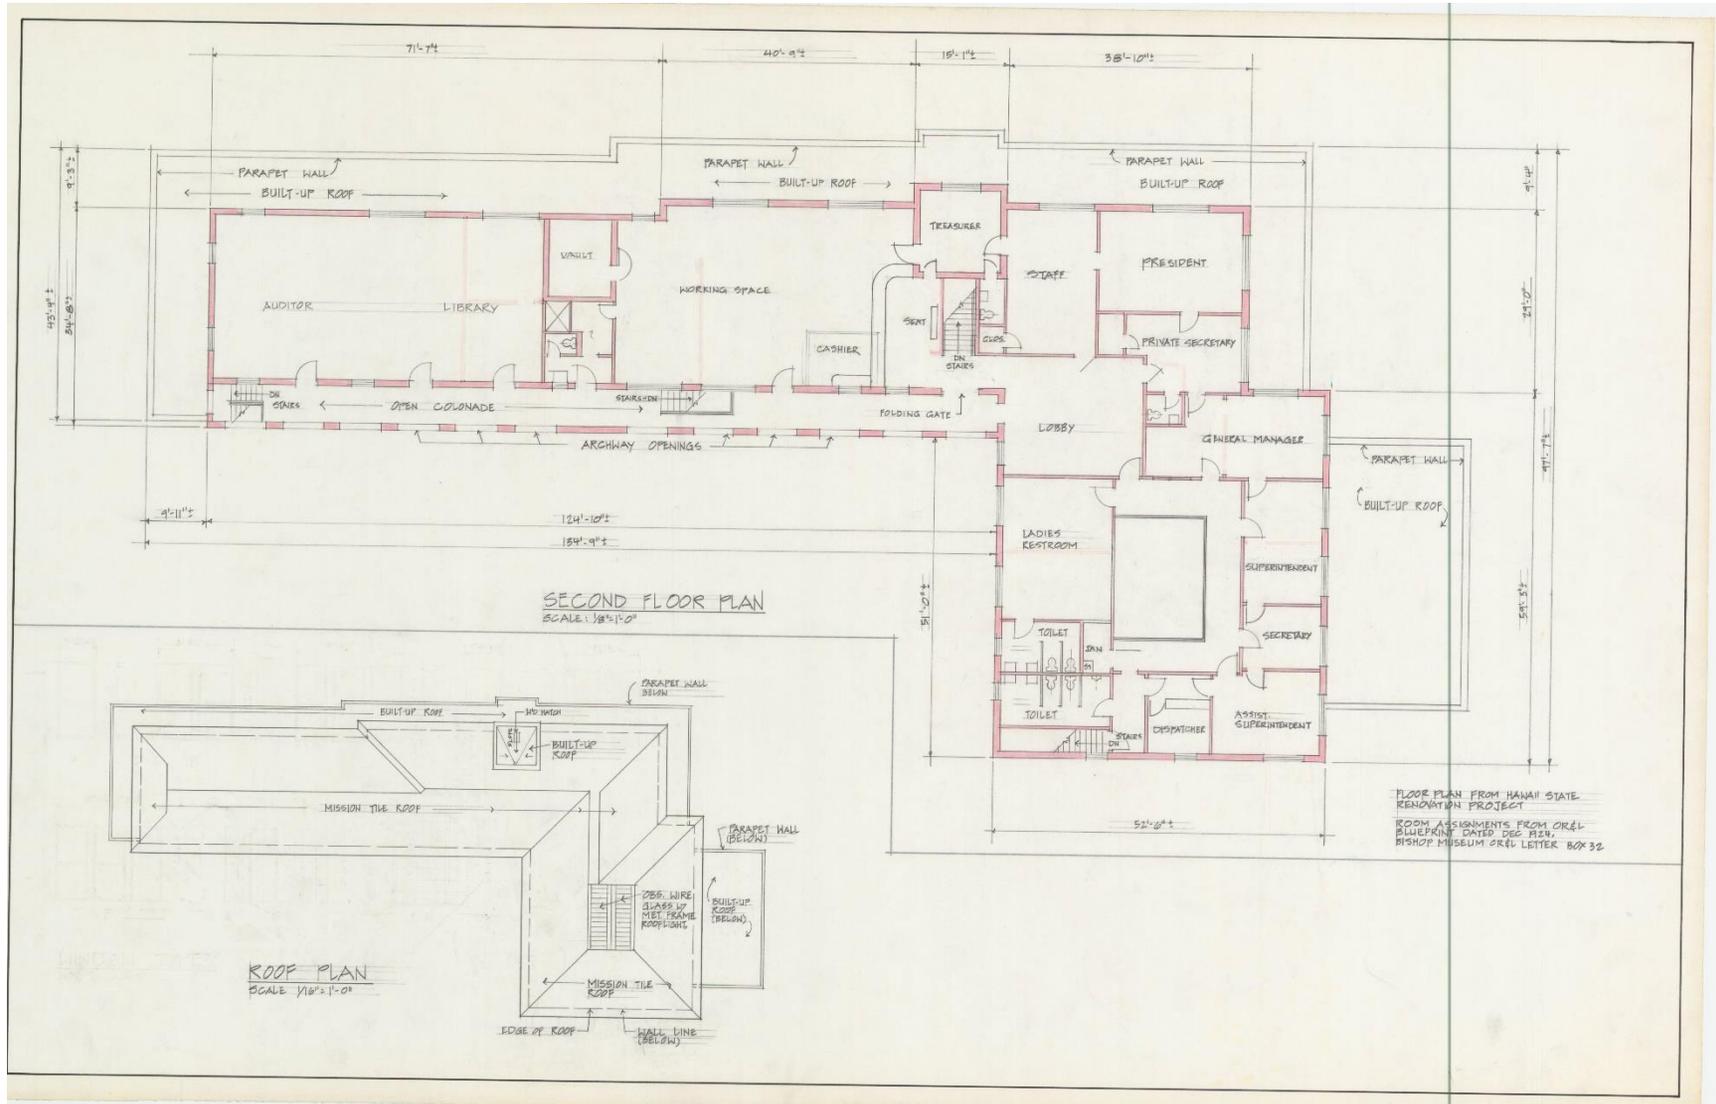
Tracing of 1975 Second Floor demolition drawing with original room functions added. Courtesy Hawaiian Railway Society.
